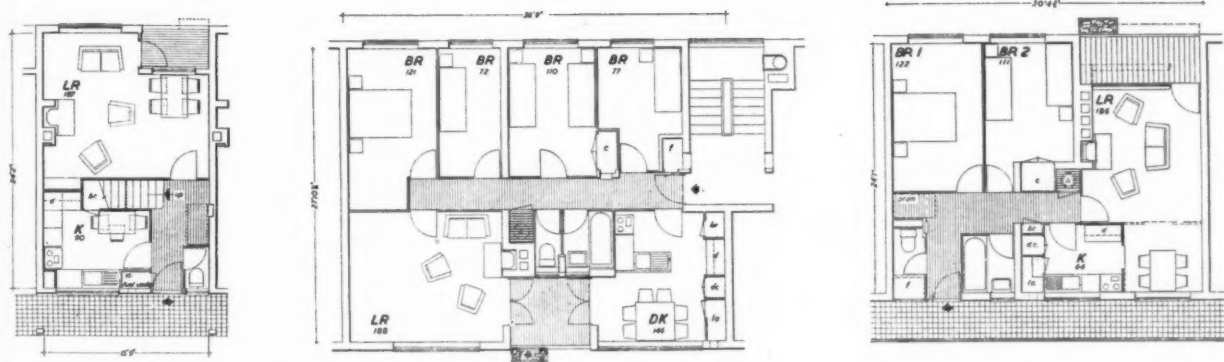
(above left). Ground floor plan of LCC's 4-storey maisonettes, type MA.A4. According to the survey reviewed here, tenants do not like this plan arrangement because the balcony is recessed into the living room and they like their living room to be "squared off." Fig. 2 (centre). Plan of LCC's staircase-access flat for use in 3-storey blocks, type SA.G5. This arrangement, which gives access from both living room and kitchen, seems to be popular with tenants. If they have to choose access from one or the other they prefer access from the kitchen. Window boxes are, on
